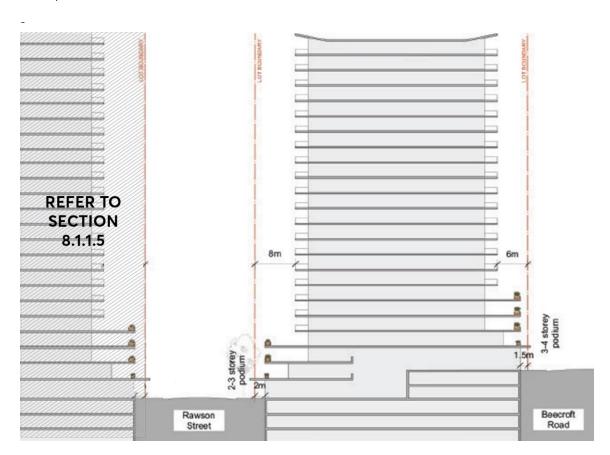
Setbacks to Rawson Street and Beecroft Road
